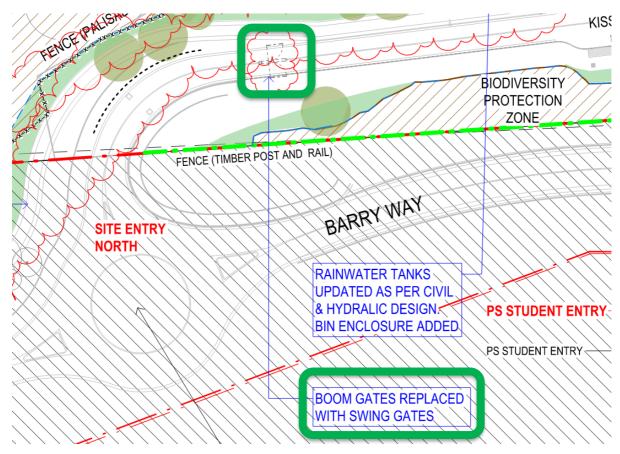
SITE ENTRY NORTH Source: Pedavoli Architects
